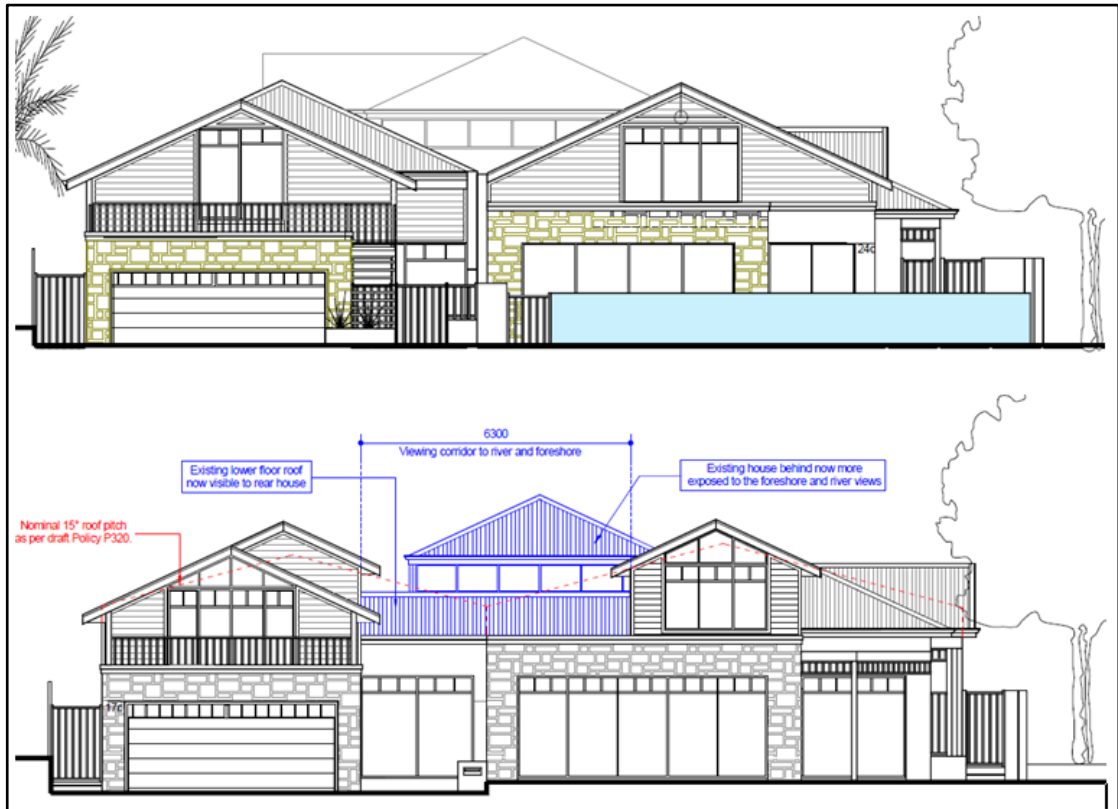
Changes to the proposed roof design from November Council Meeting Item (top picture). The figure superimposes the proposed dwellings on the subject site and demonstrates the newly revised viewing corridor for No. 47 Letchworth Centre Avenue.
